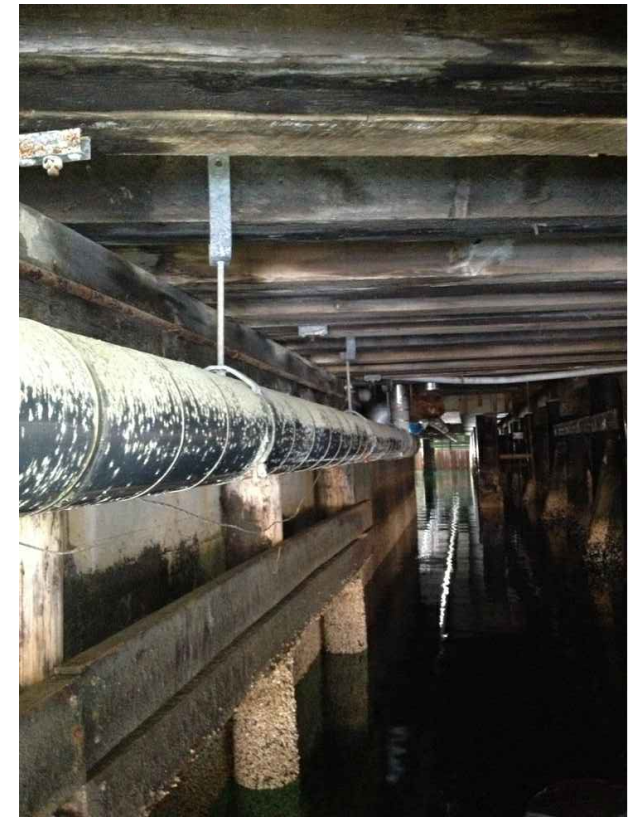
TIMBER PILED JETTY AT TIMBER CRIB LOOKING SOUTH – NOTE FENDERING AT FACE OF TIMBER CRIB
